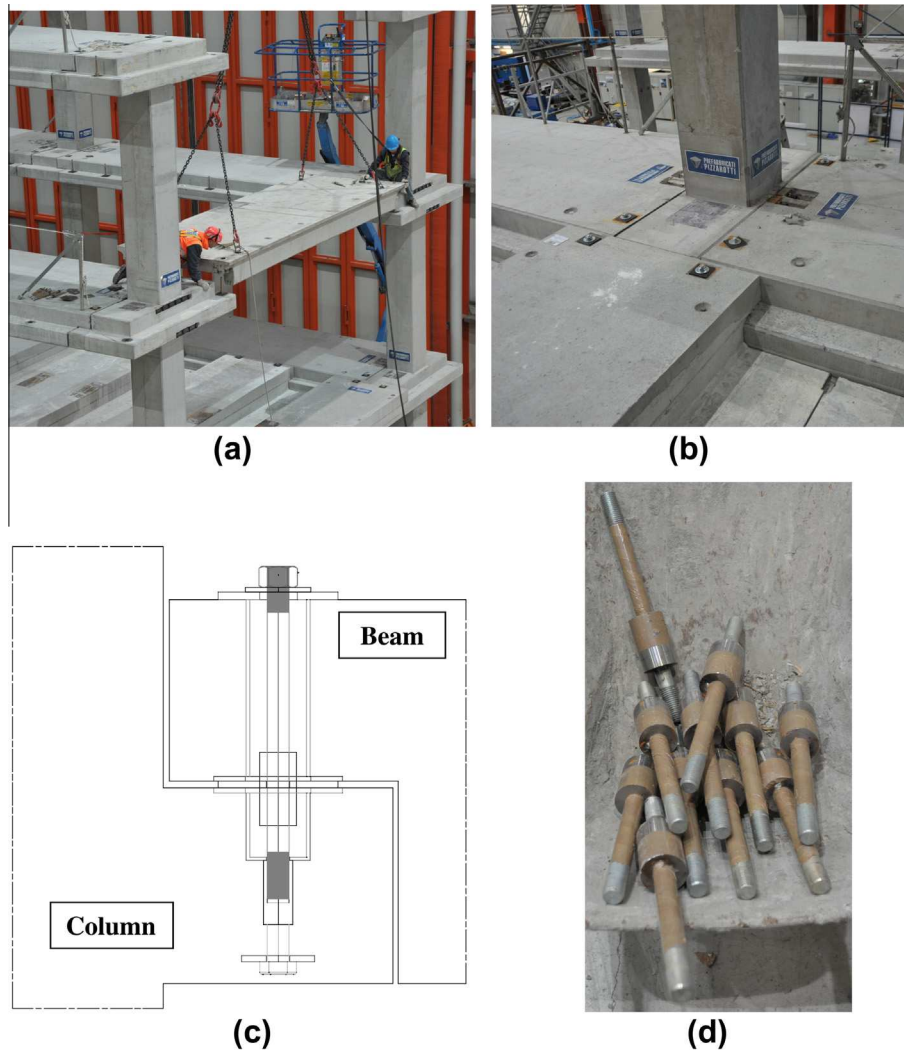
(a) Seating of a secondary beam on the column capital. (b) A central beam–column joint. (c) Detail of a pinned beam–column joint connection. (d) Special dowels with increased diameter at the critical section.
